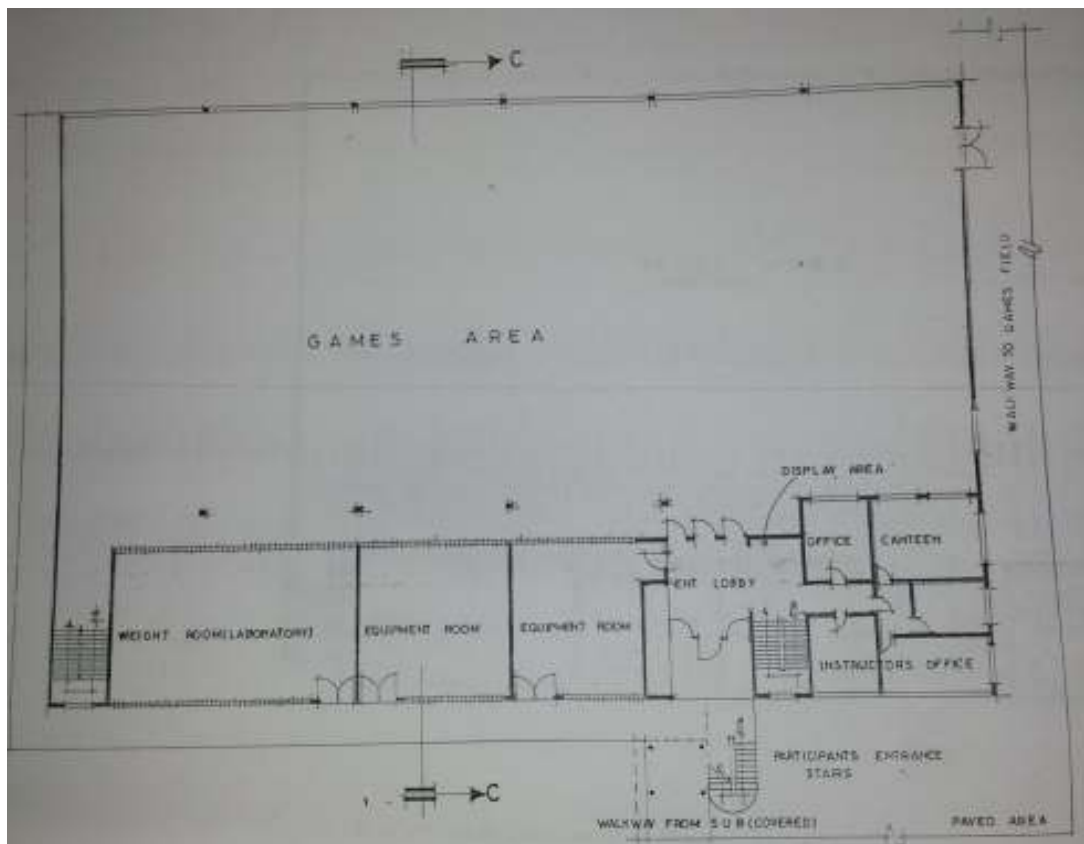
Showing ground floor plan of OAU indoor sports hall.
